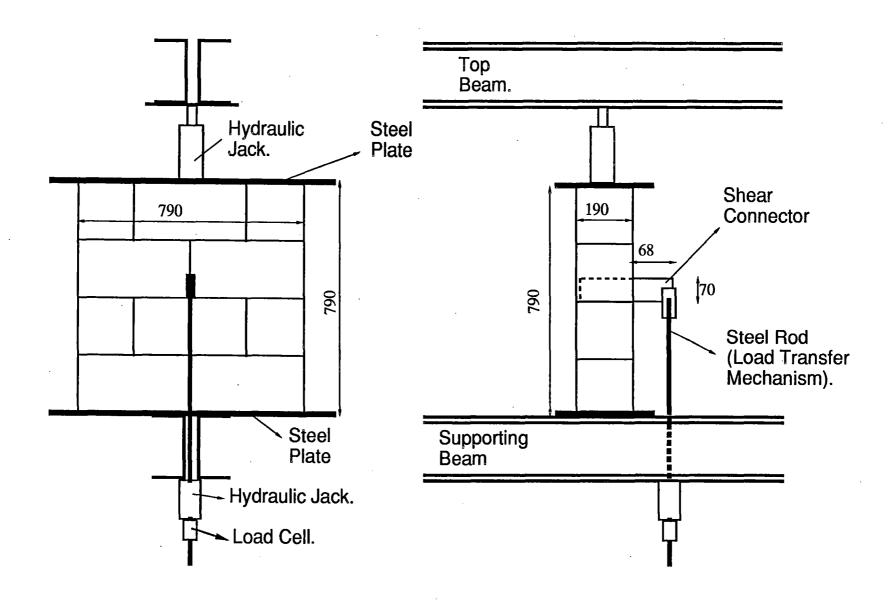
Dimensions and Testing Setup for Wall Segments
